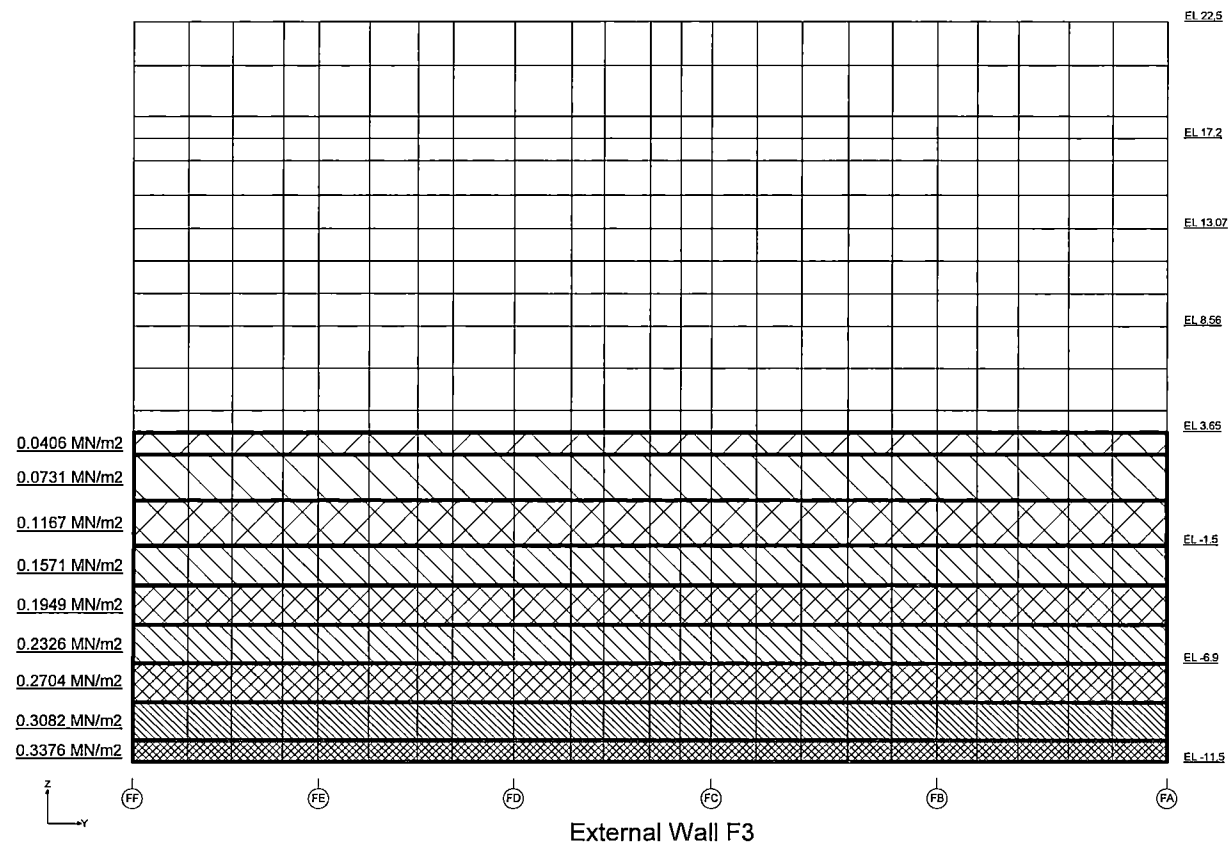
Lateral Soil Pressure Load at Rest (F3 External Wall)
